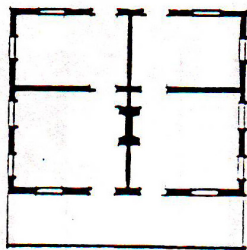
Diagram, typical 4-room plan / Plano de planta típica para 4 recintos.
